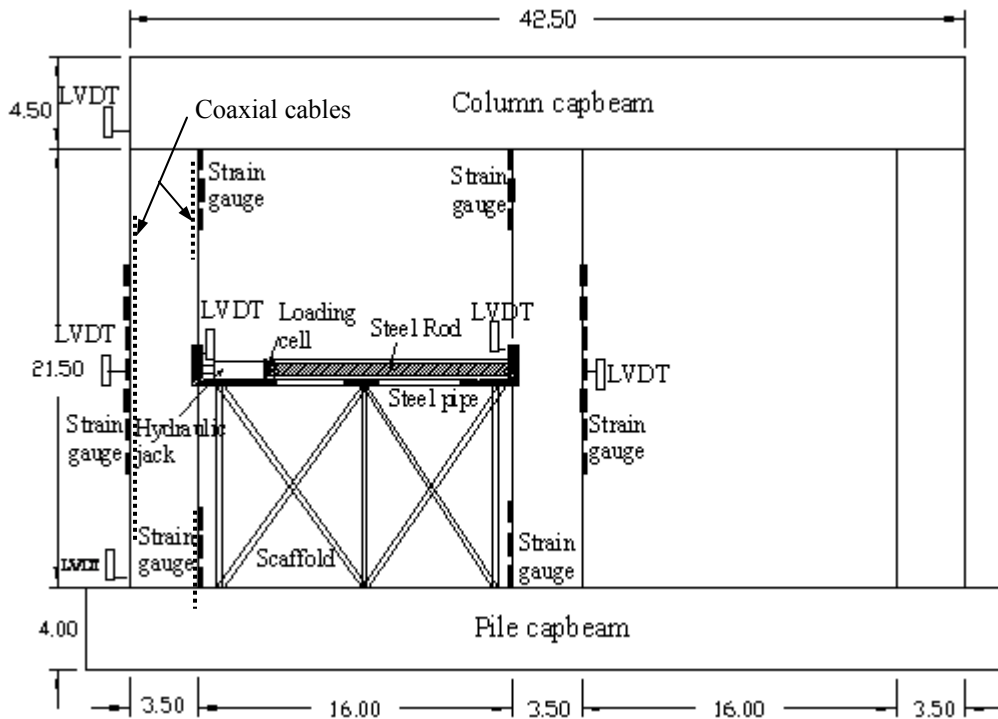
Test Setup of Bridge Column (all dimensions in ft)
